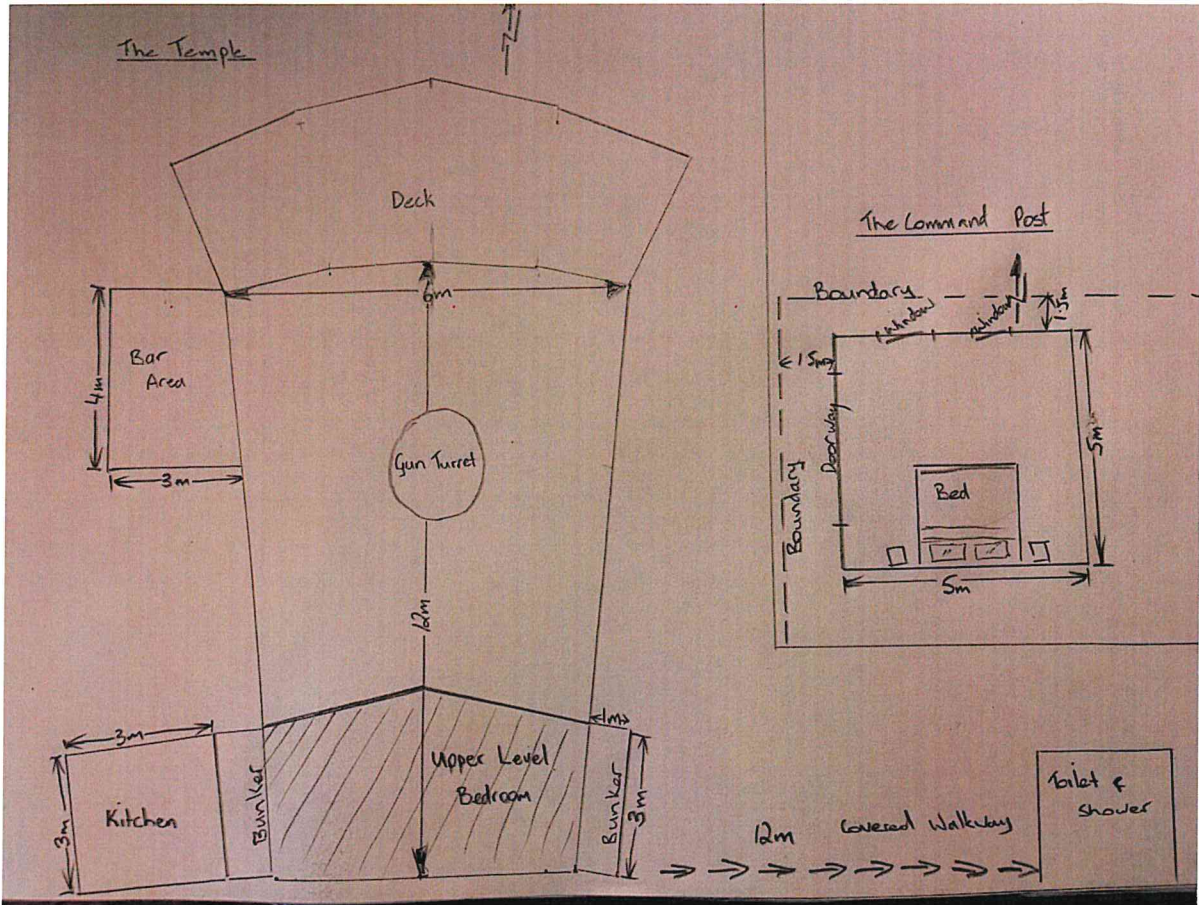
Figure G - Phase 1A: Dwelling House (Indicative Sketch) – Existing Building Work
